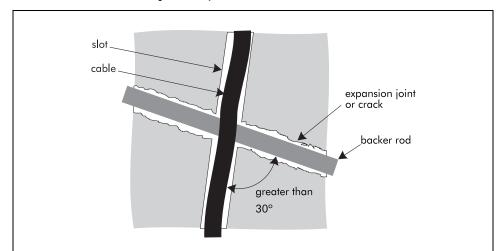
illustrates how to cross an expansion joint or crack.
